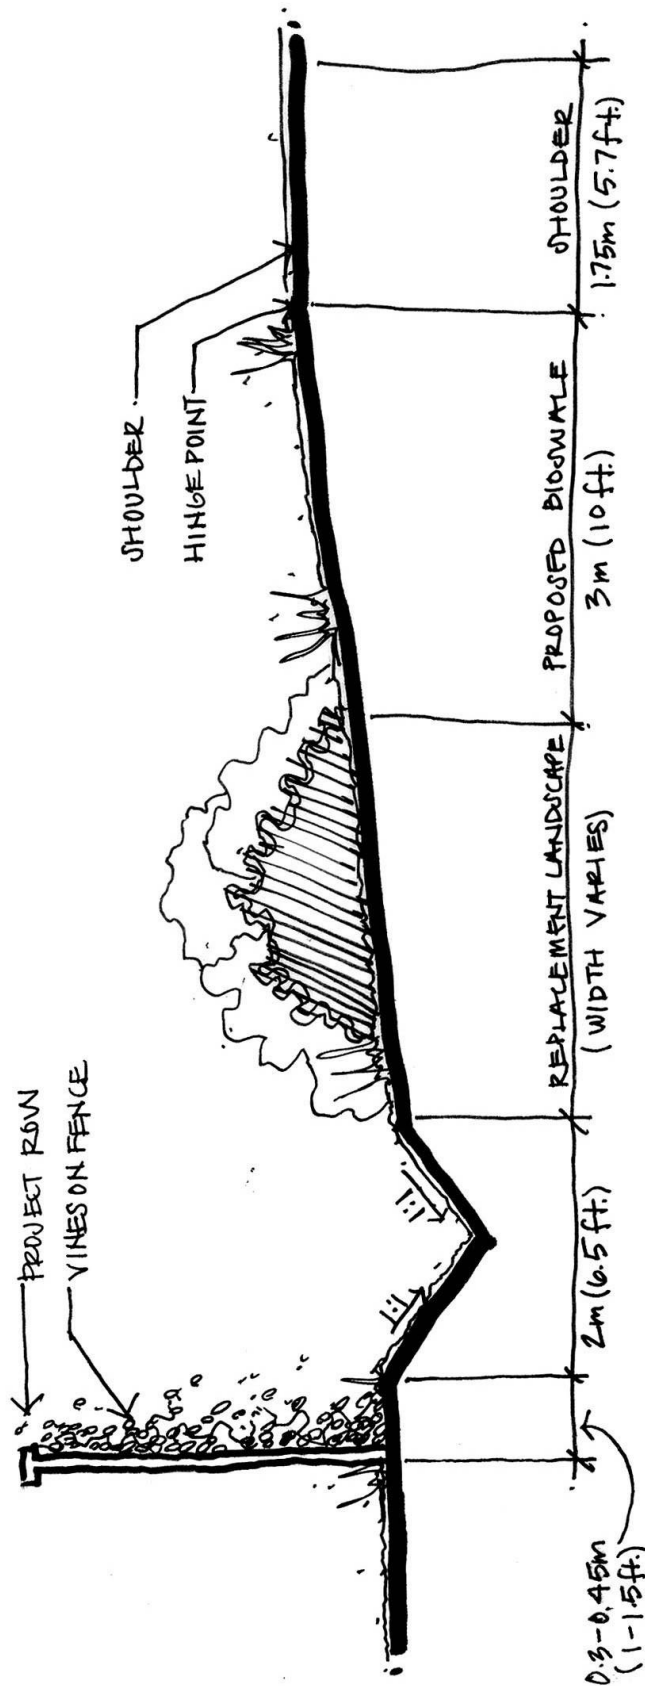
Typical Cross Section in Southwest Project Quadrant
